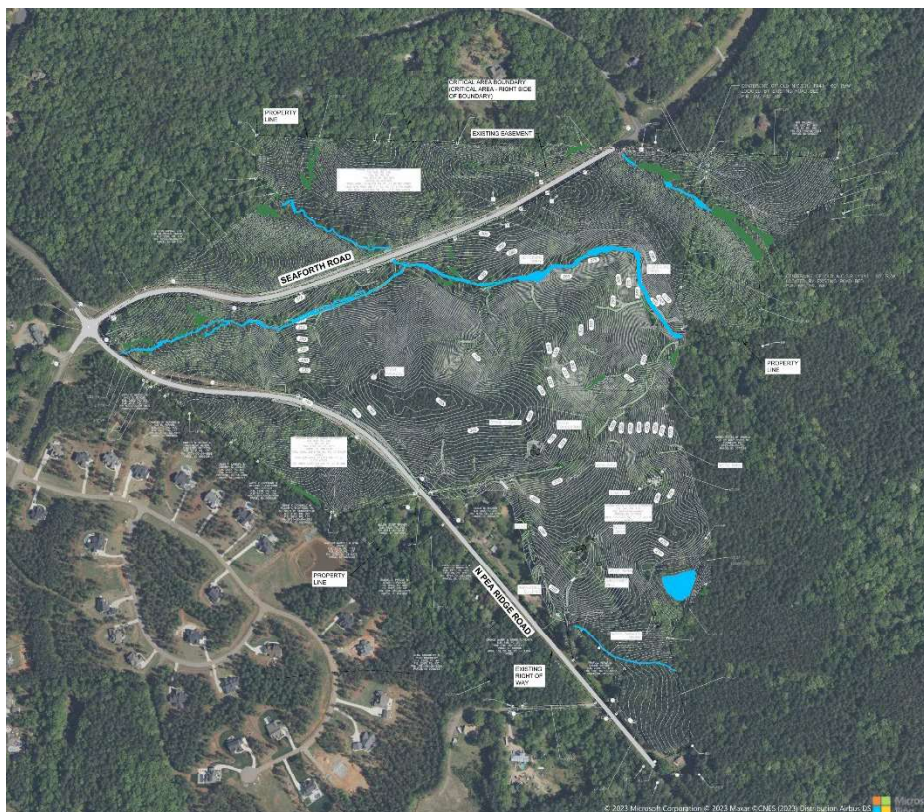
| Existing Conditions Site Plan (Aerial Map)
